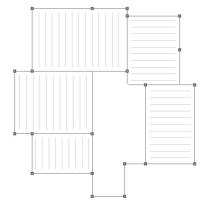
Second Floor Structural System - diagram showing the proposed structural components of the Second Floor
